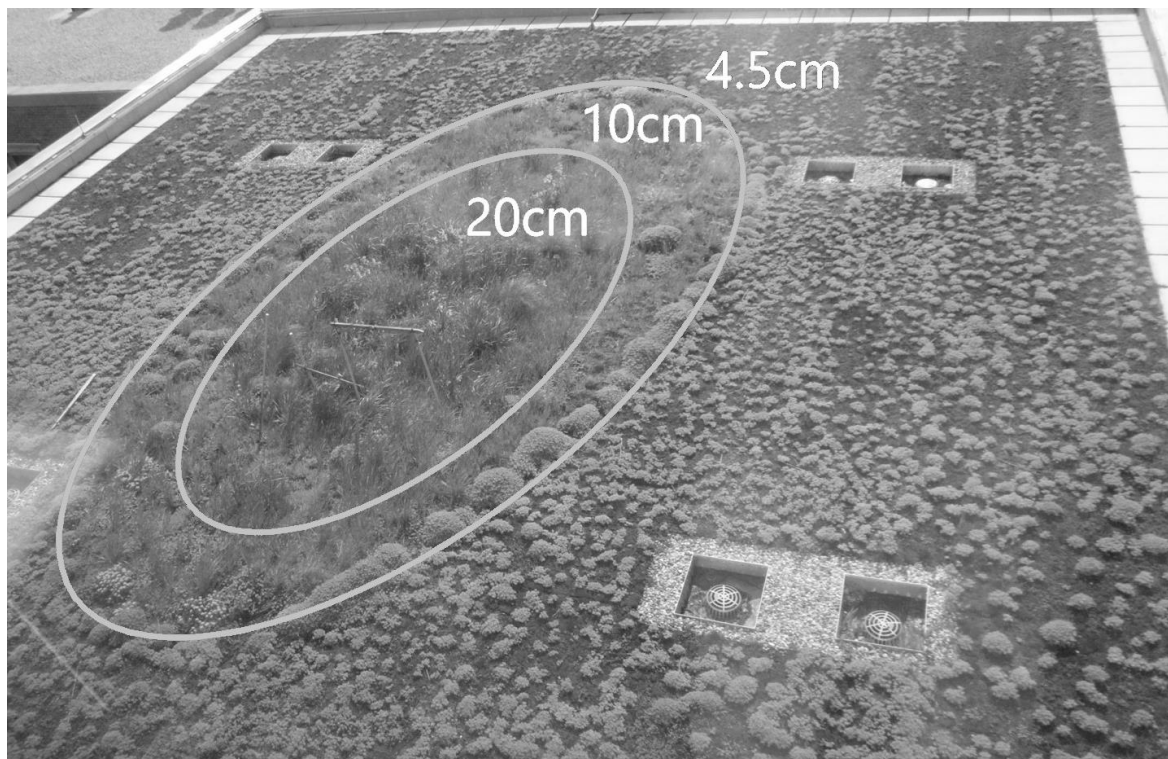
The green roof research site located on the Molecular Plant and Soil Sciences Building at Michigan State University.
